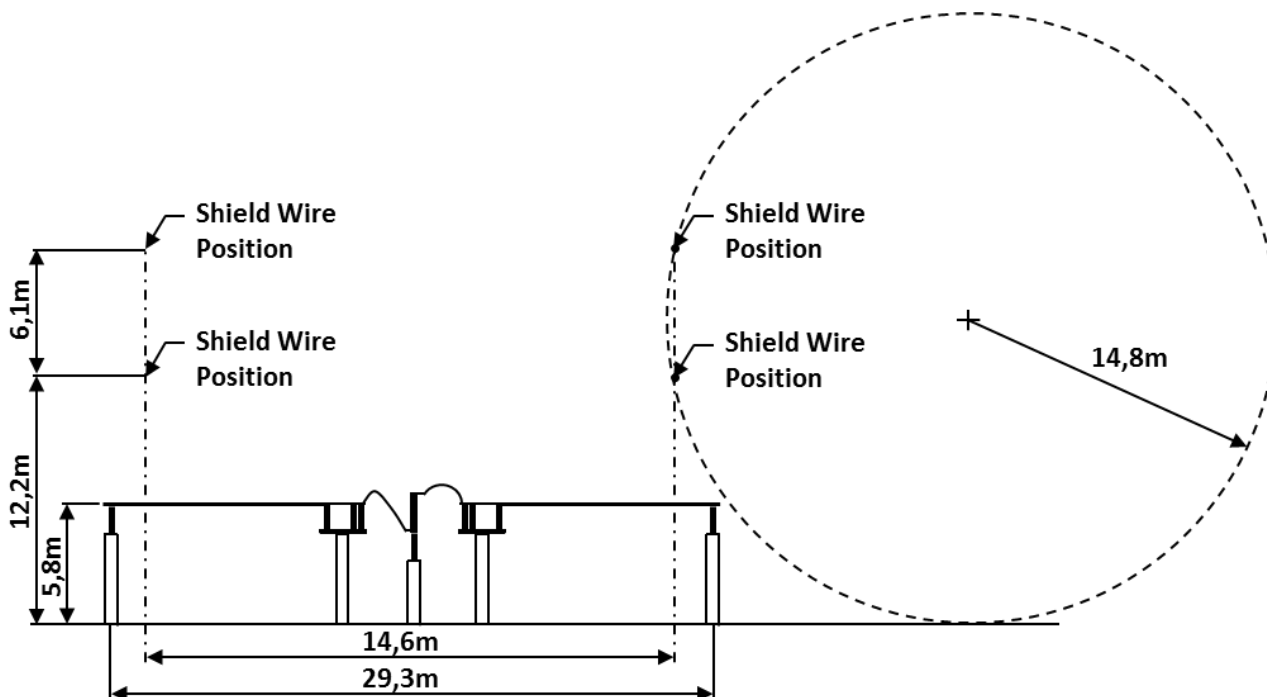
Proposed protection by shield wire and masts for 66kV switchyard - Section on B-B
